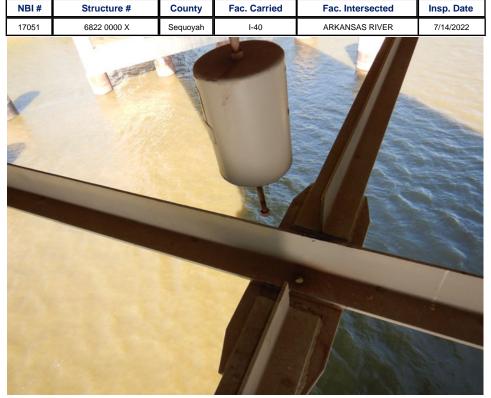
Looking south at girder 1, span 4 at end of horizontal splice near floor beam 5. Note: weld appears to be splintering. No crack observed.
